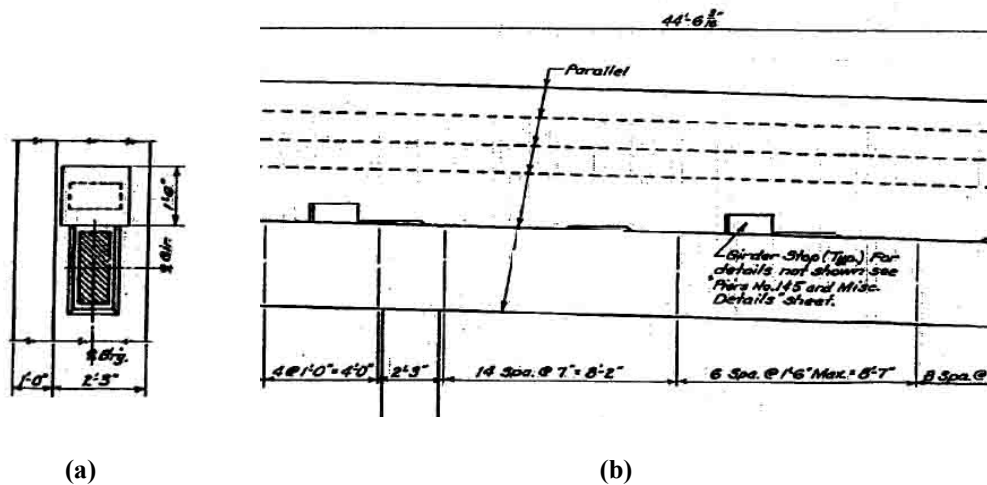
Bridge 512/19 Girder Stop : (a) Plan View and (b) Locations
